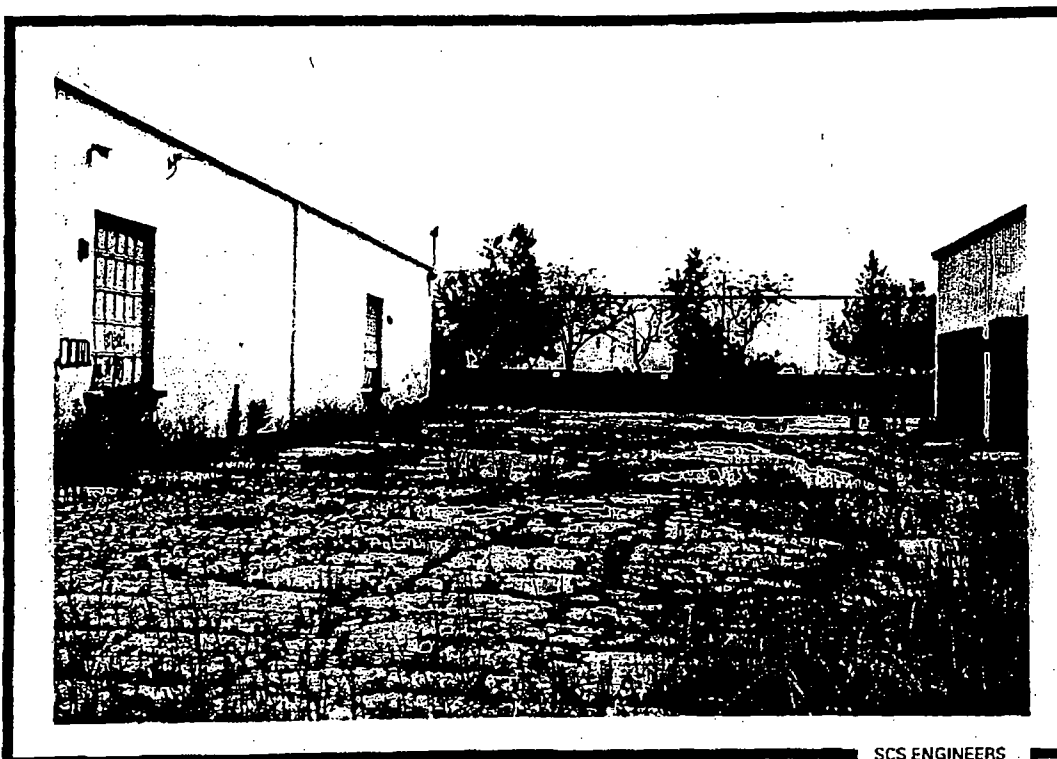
View from Southeast Corner of Property Looking to West; Concrete Bermed Area Previously Used for Above-Ground Storage Tanks.
